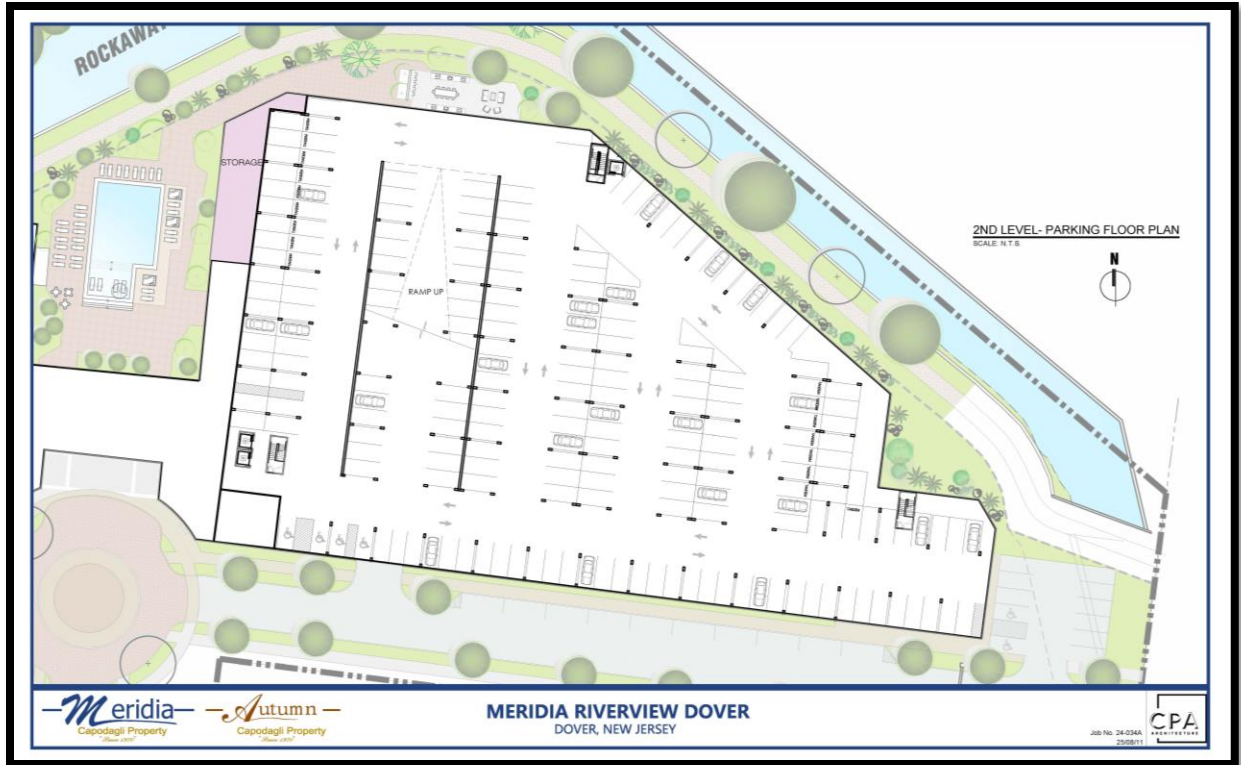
Conceptual Site Plan Building Phase 1: Below Grade Parking Level Typ.
